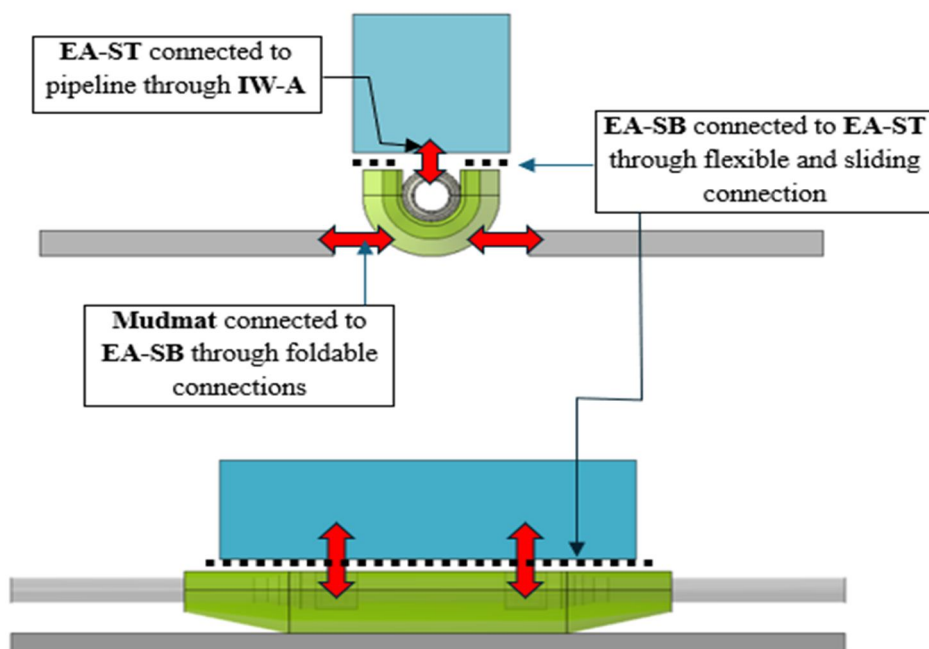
Example 2 - Structural Assembly to suit Pipeline sliding
